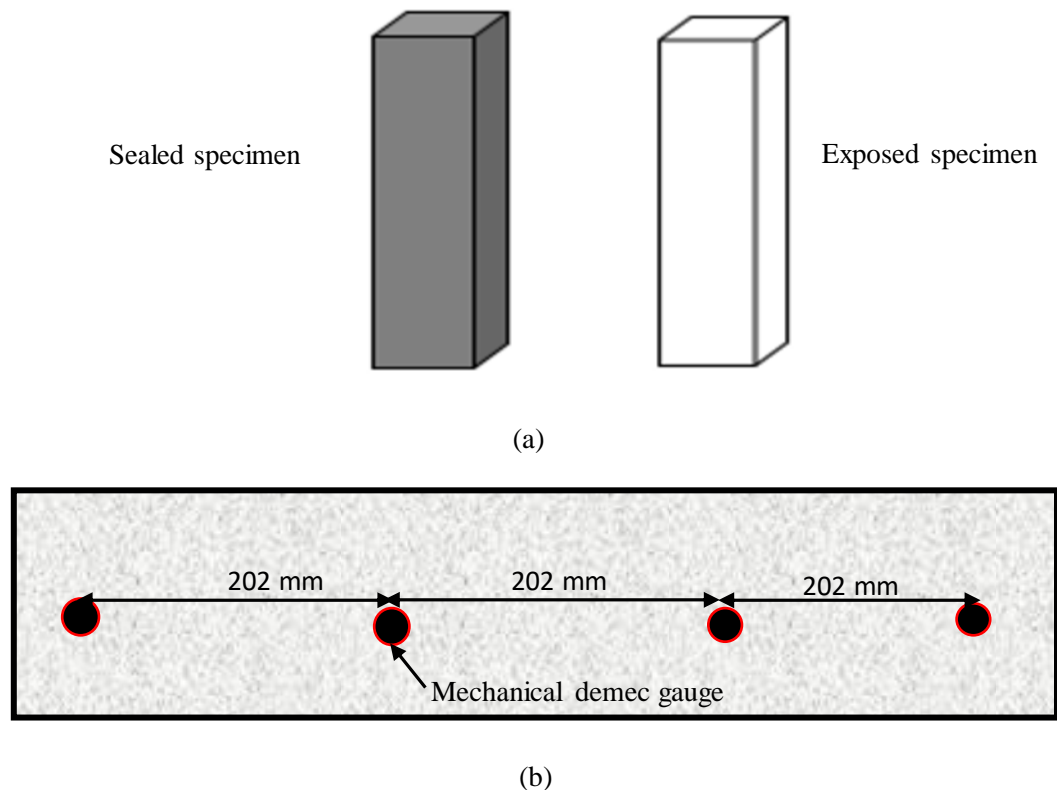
(a) sealing of specimen for shrinkage test and (b) Location of mechanical Demec points on the specimen.
